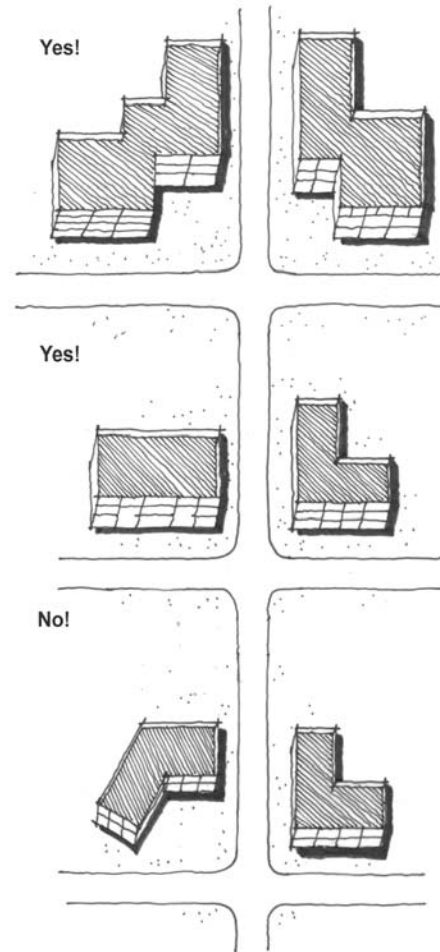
Within each intersection quadrant, new buildings shall be organized to align with existing buildings located across the intersecting thoroughfare streets.
